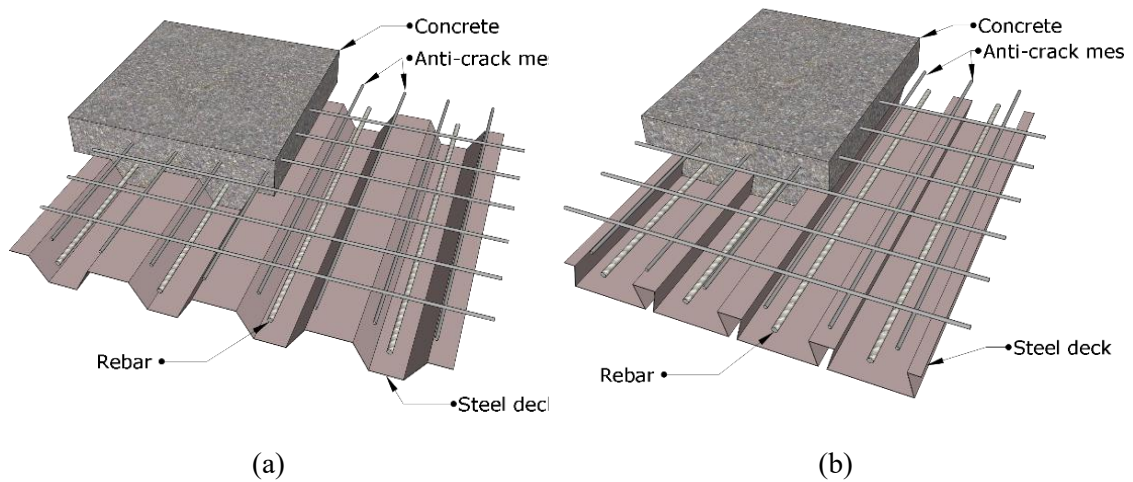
Usual layout of composite slab profiles: (a) Trapezoidal, (b) Re-entrant. [4]
